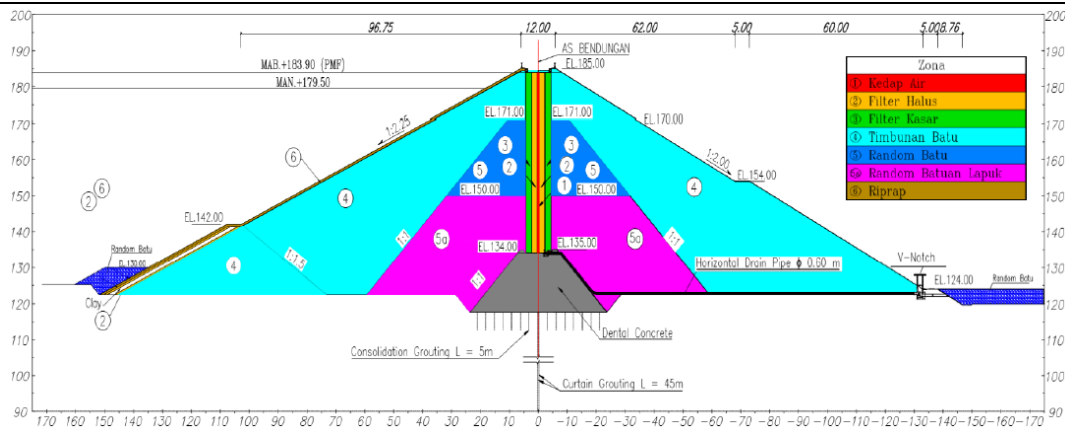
Cross Section of the Core Zone with Concrete Asphalt
